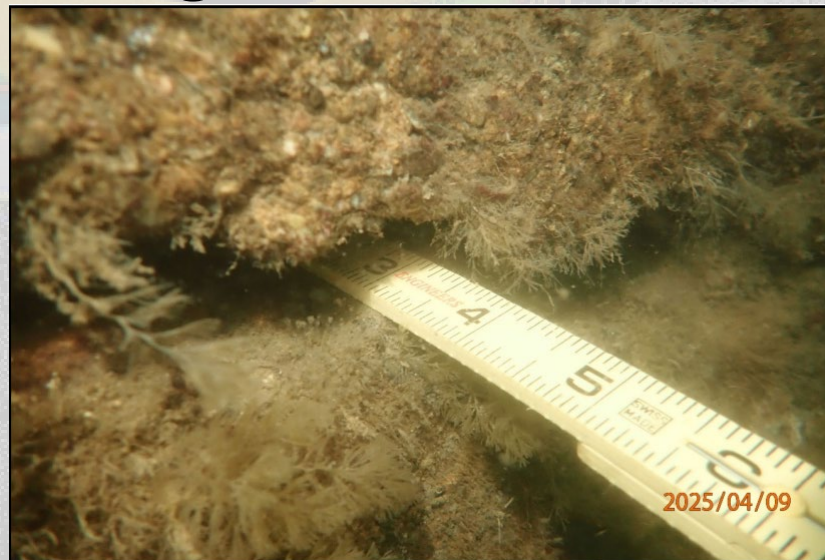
South Tower Pier, Voiding at Cold Joint at ELEV. -10.2
